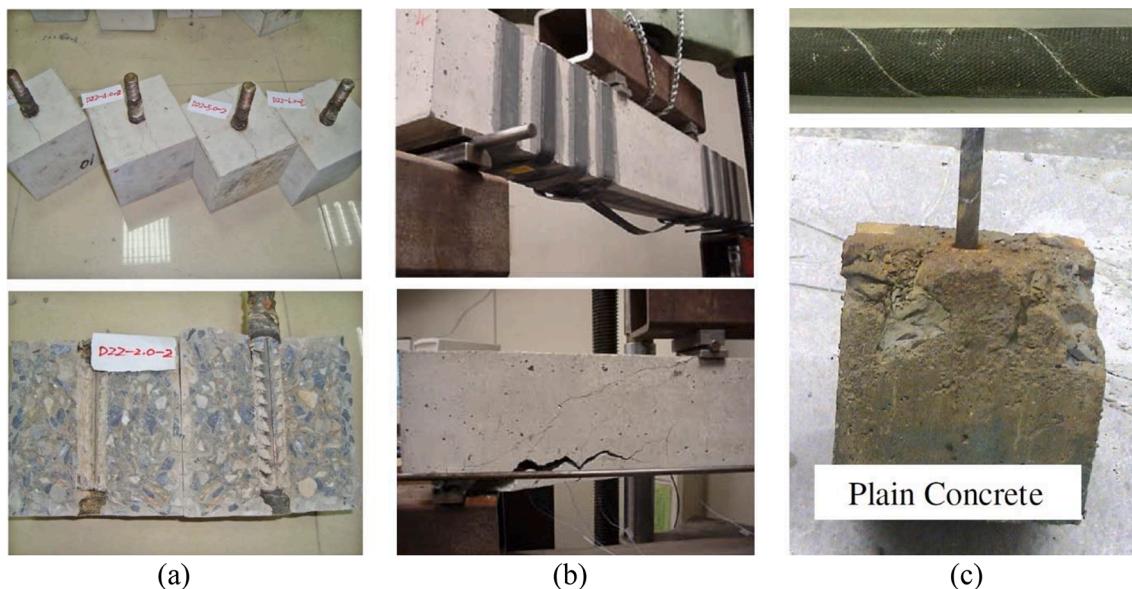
Bond of (a) steel bar embedded in concrete [570], (b) FRP sheet attached to concrete [571], and (c) FRP bar embedded in concrete [572].
